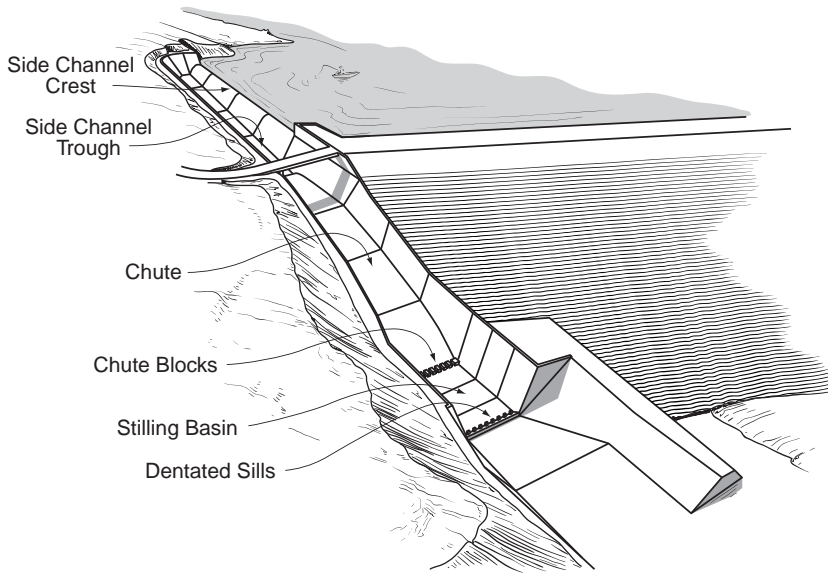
Typical side channel and chute spillway arrangement. (Adapted from Department of the Interior, Bureau of Reclamation, *Design of Small Dams*, p. 355, from Department of the Interior, Bureau of Reclamation.)
